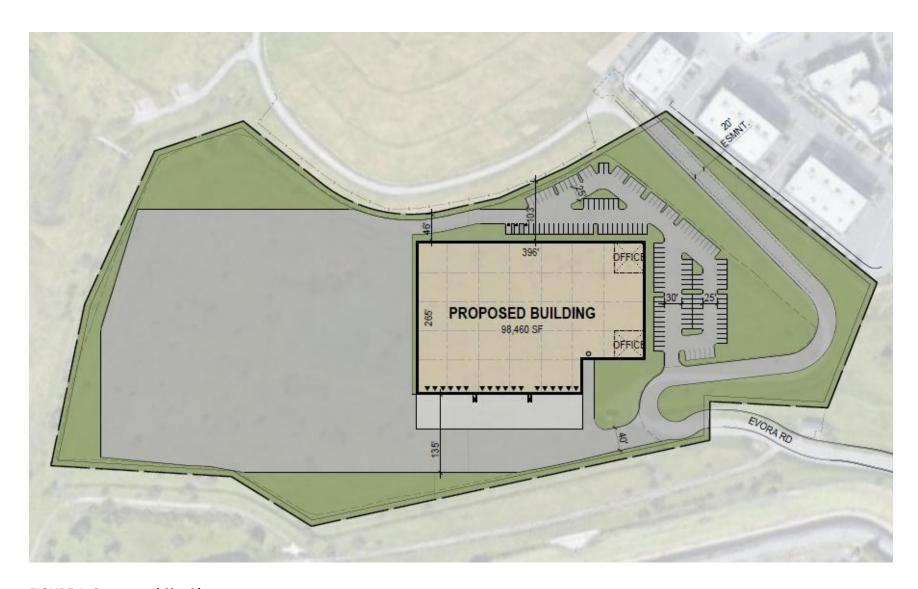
Conceptual Site Plan Source: Ware Malcomb, 05/13/20
